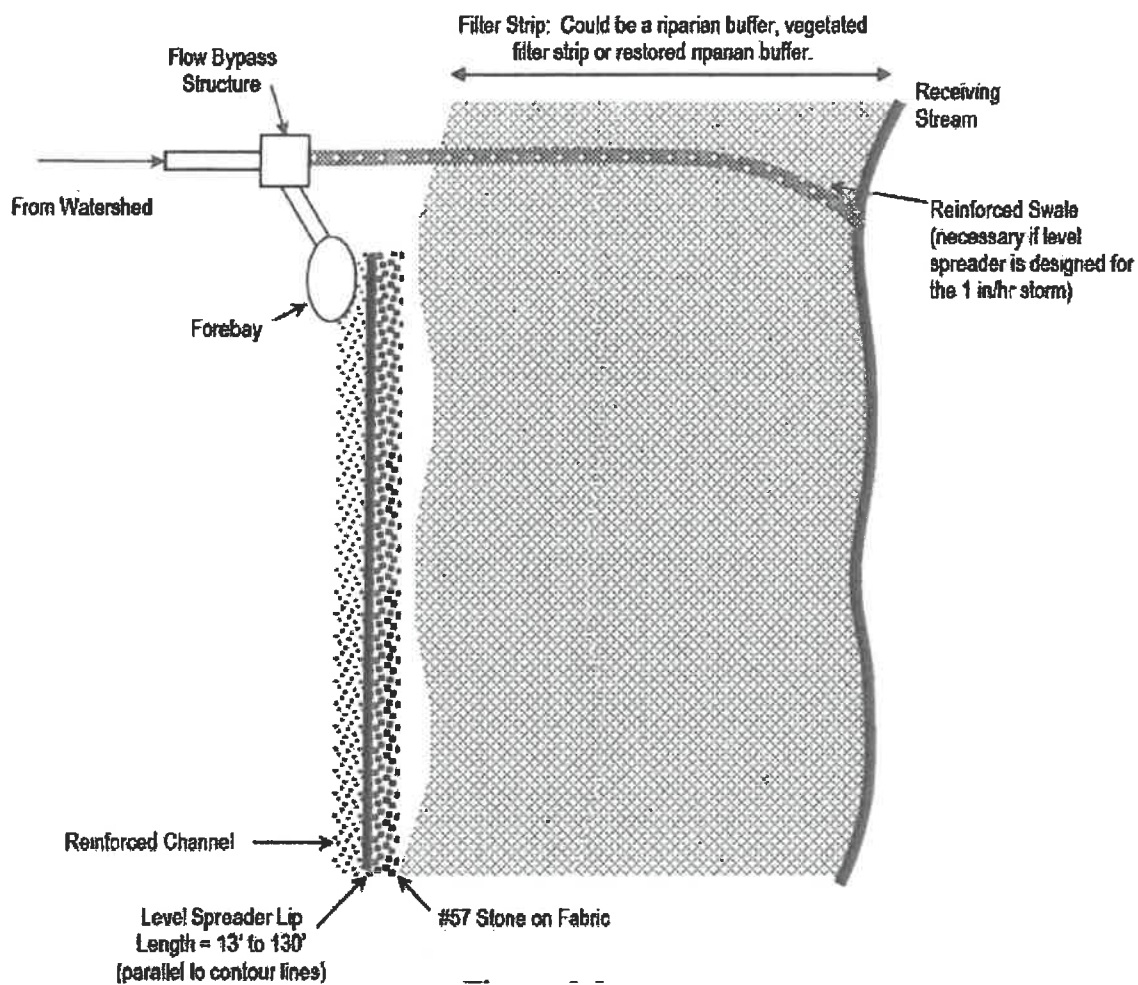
Plan and Cross Section of Engineered Level Spreader (ELS)
